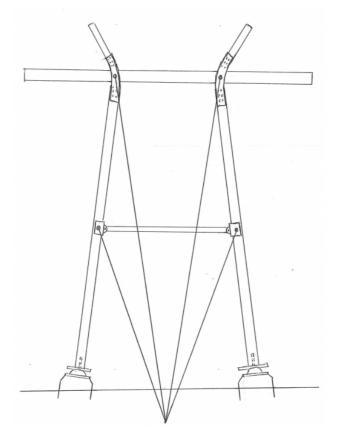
Conceptual sketch of connections for tubular steel tower. Dimensions are given on Figure 3.2.
